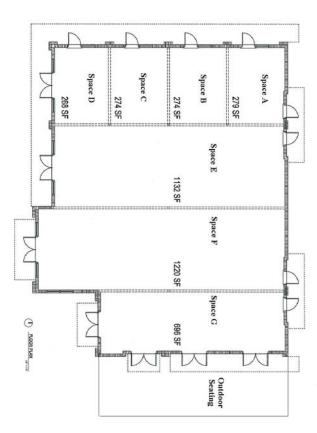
Ground Floor Plan of future 731 Building (Rendering by Dorsky Yue Architects)
